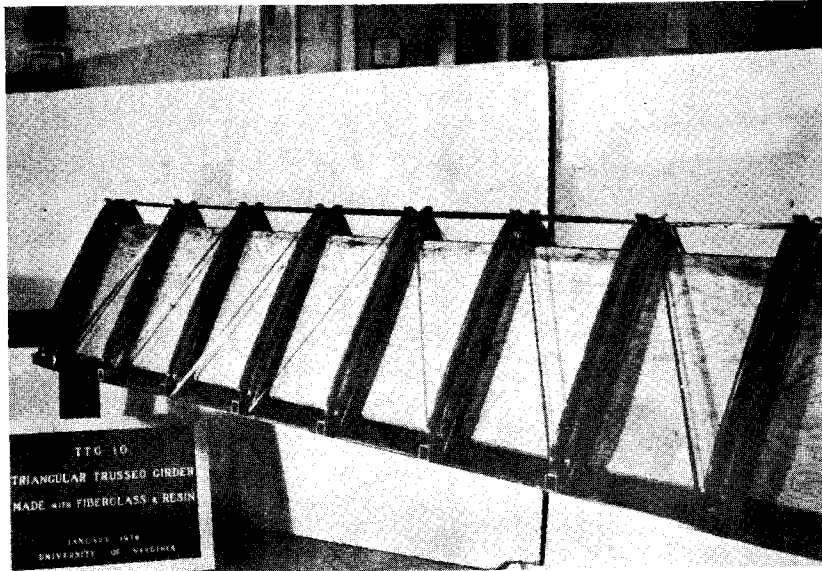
Specimen TTG-10 after winding tension elements and prior to removal from the mandrel.
